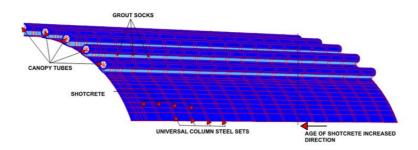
Structural members in PLAXIS 3D Tunnel modelling
